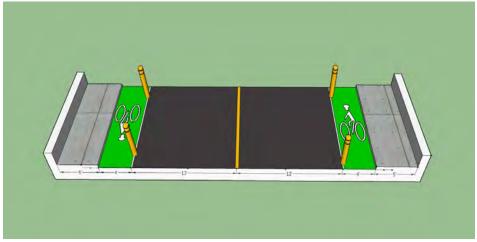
Proposed redesign for Bill Kennedy Way bridge over I-20 A painted and semi-protected bike lane in each direction, with improved sidewalks. This will be a key walking and biking connection for thriving communities south of I-20 to reach the new terminus of the Eastside Trail at Memorial Drive, well before the BeltLine continues southward.
